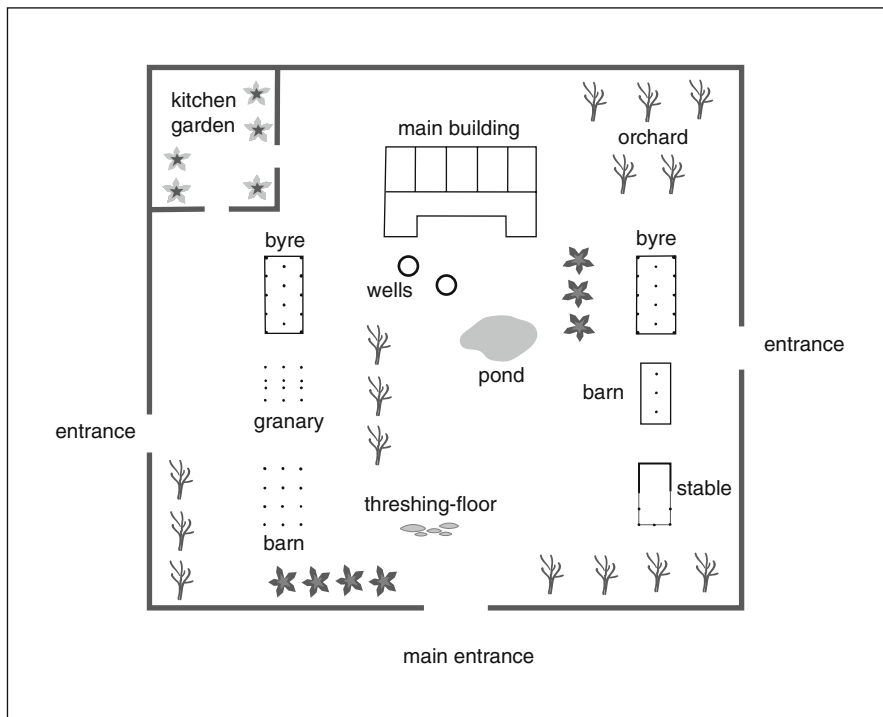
Plan of a *villa rustica*: main building, outhouses and yard
